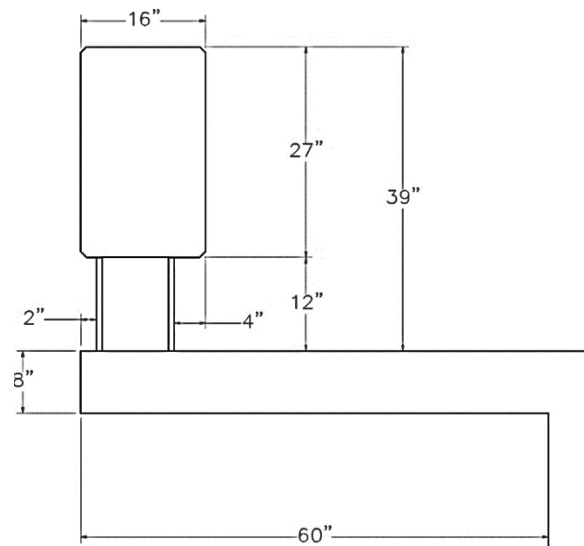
New MASH TL-4 Open Concrete Rail-Initial Configuration
